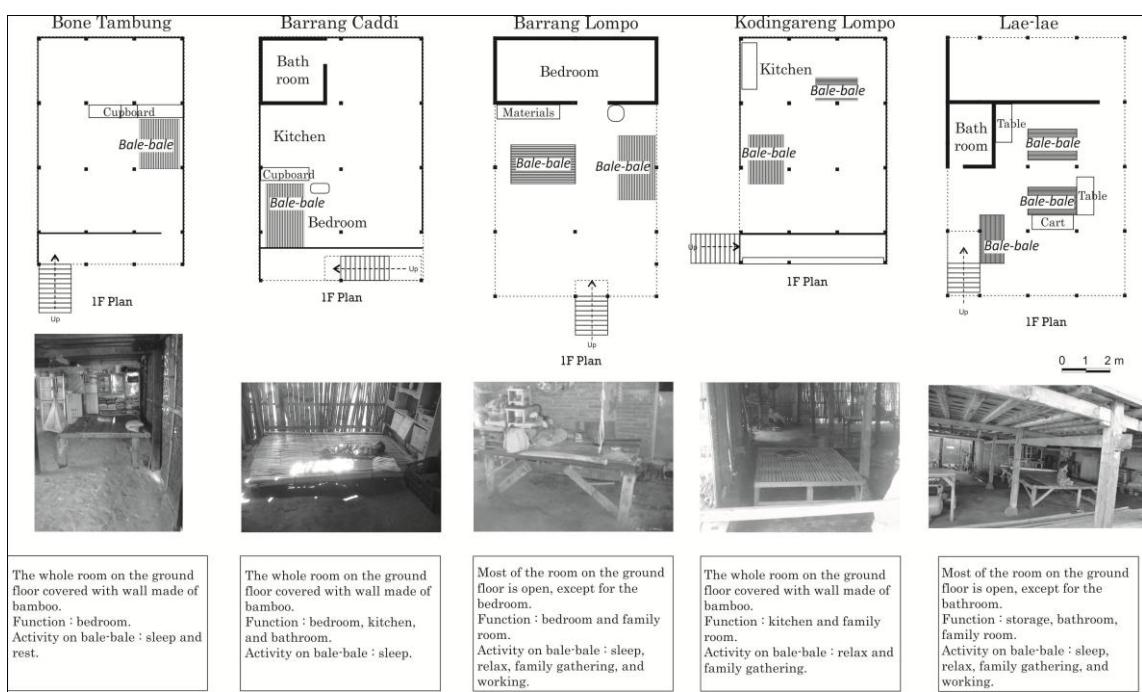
Normal bale-bale and house layout of first floor (*rumah panggung*)
